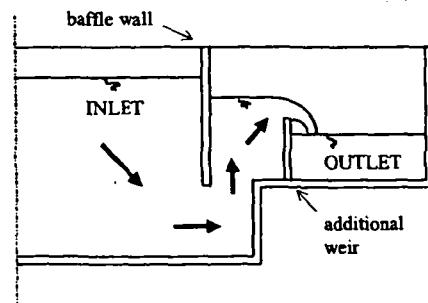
Half-section through the Wilsenach trap (straighteners not shown).
